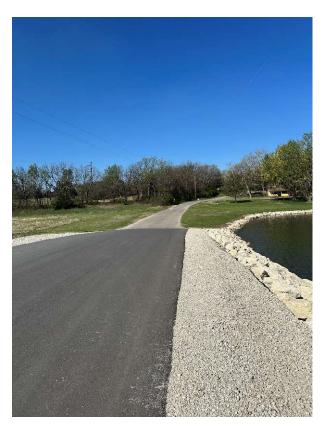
Standing on top of dam (west side) looking at auxiliary spillway control section.
